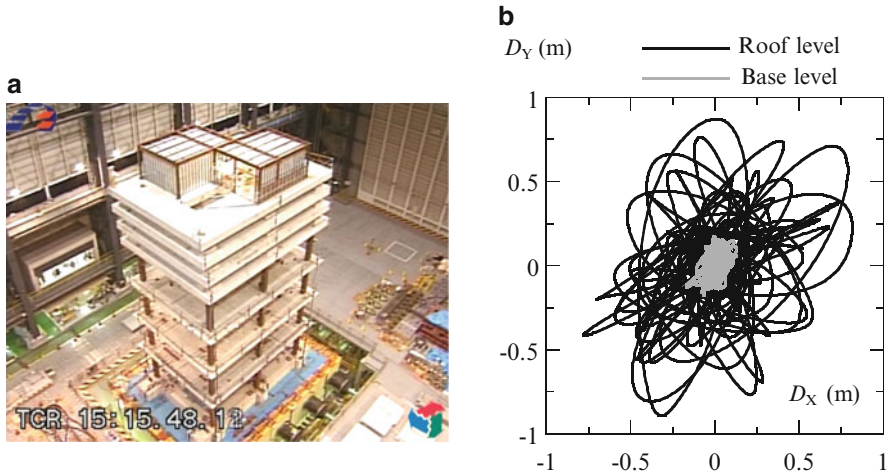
(a) Overview of test specimen, (b) floor responses of roof and base levels
